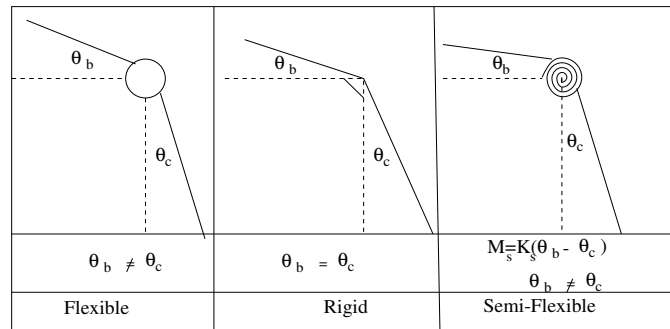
Flexible, Rigid, and Semi-Flexible Joints
